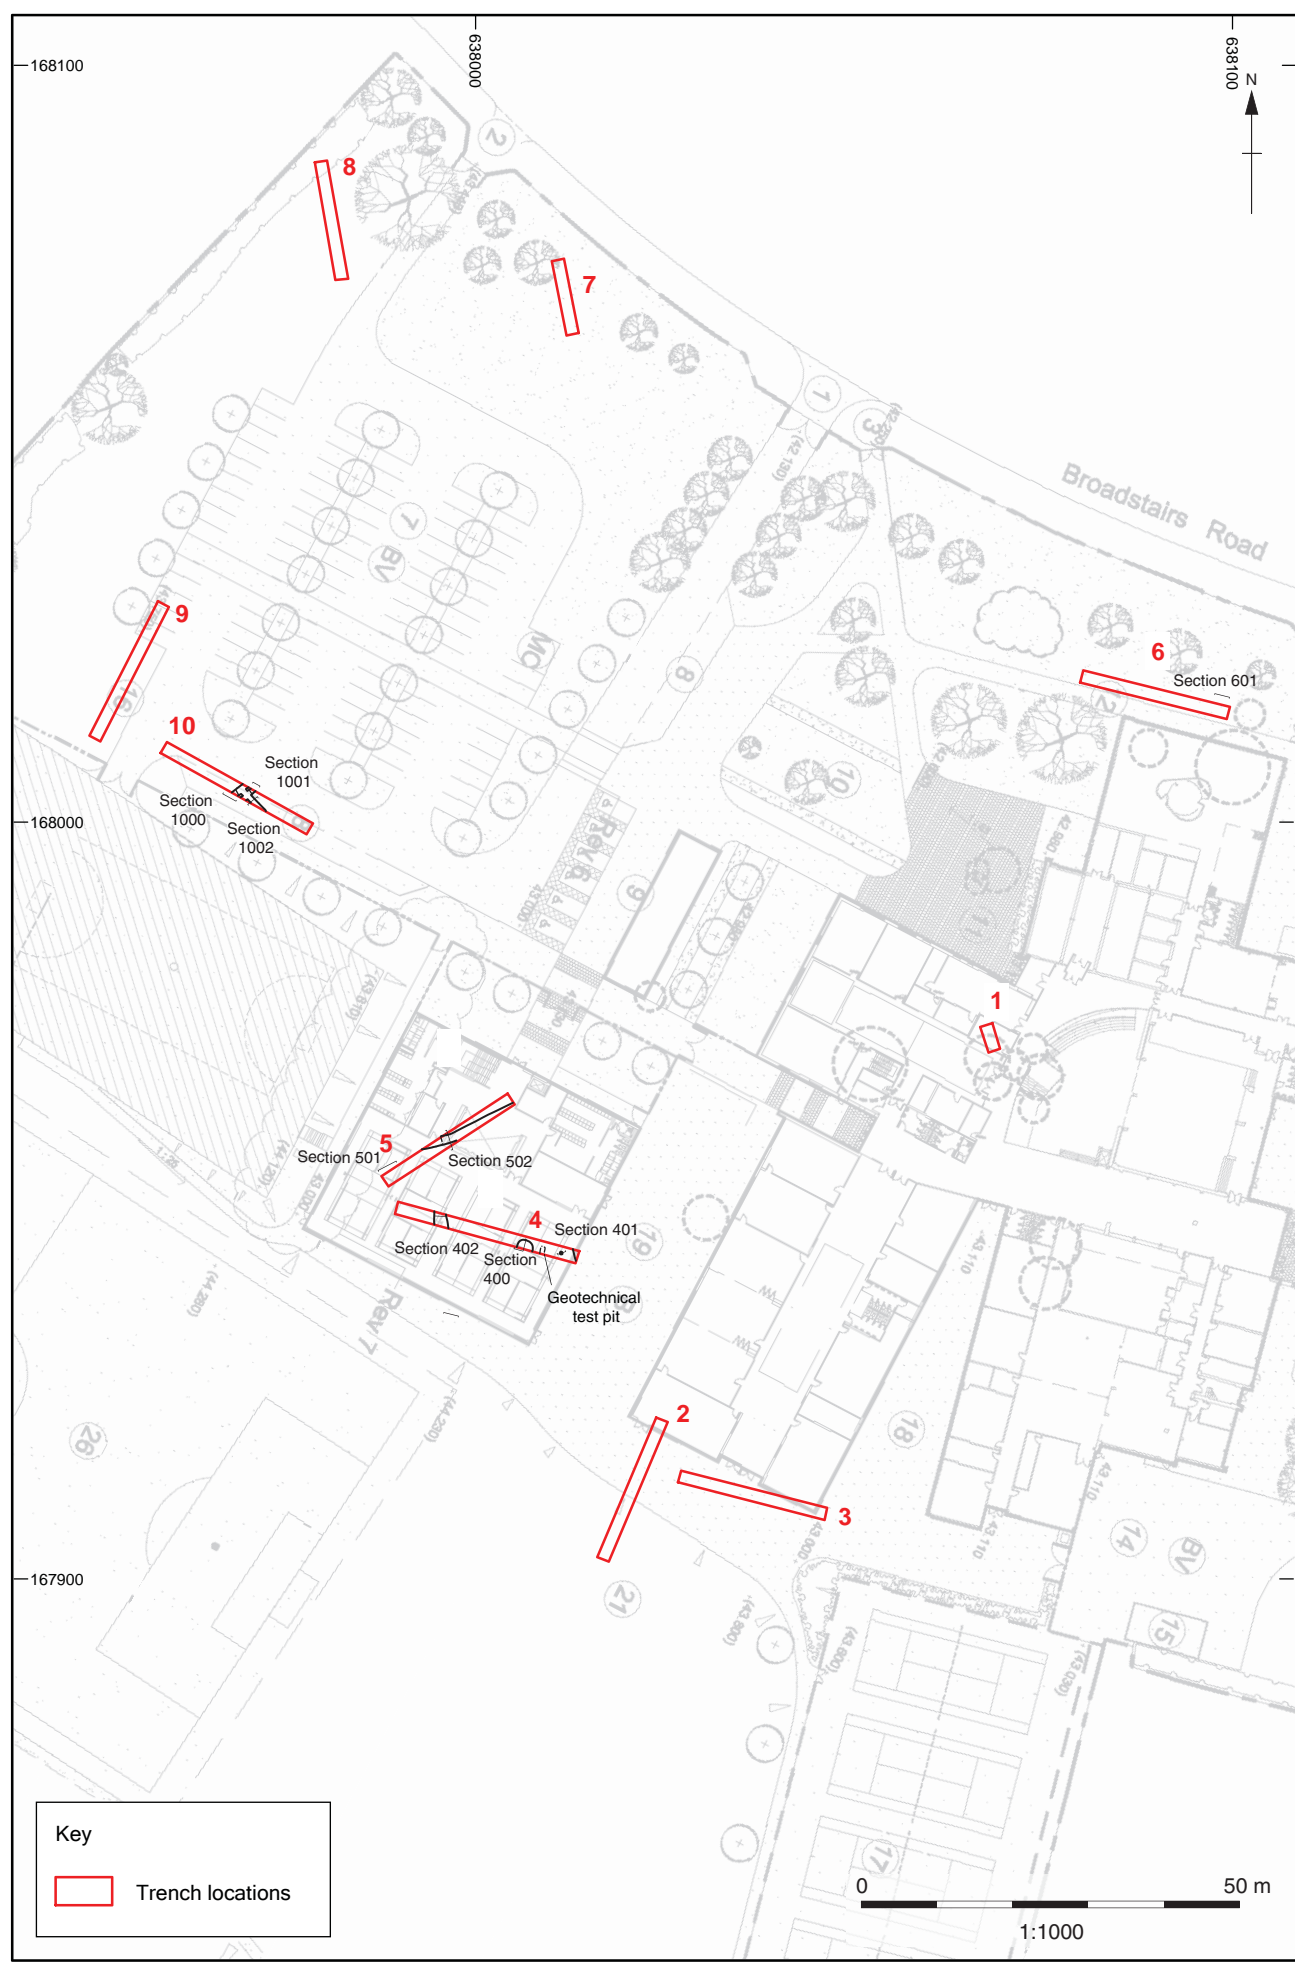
Trench location plan, overlaid on proposed Landscape Masterplan (Drawing ref: DCG-L-L-(90)X01 Rev 7).
